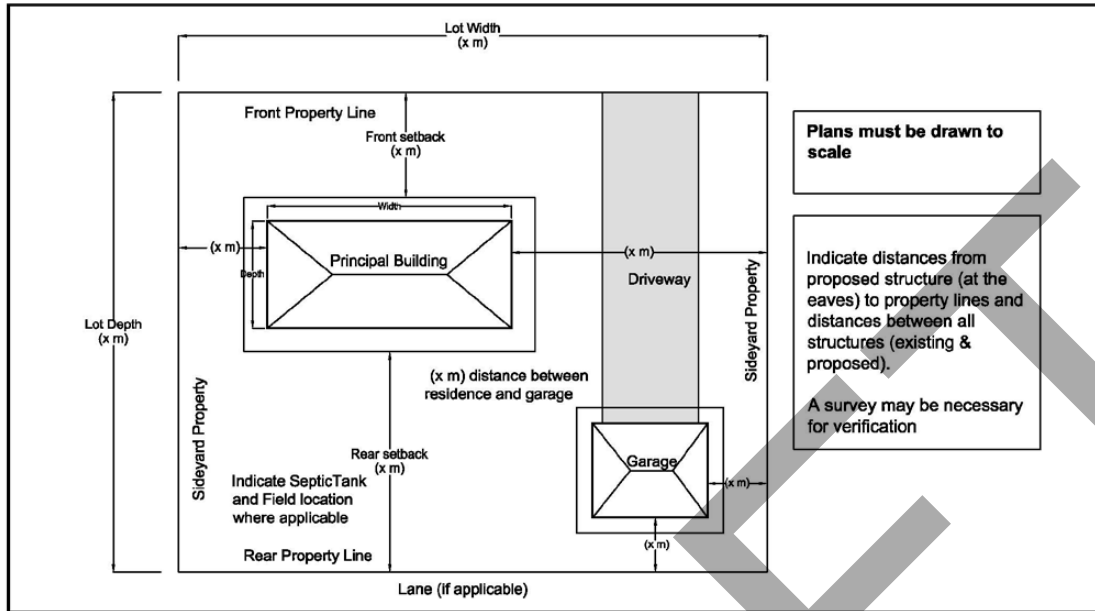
SITING OF ACCESSORY BUILDINGS
